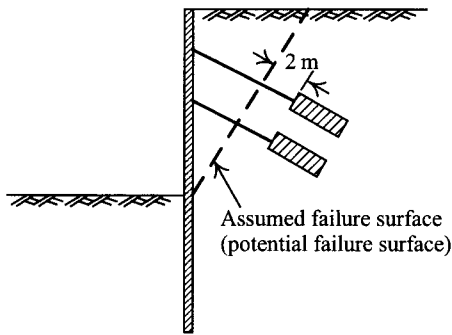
Distance between an anchorage section and the potential failure surface.
